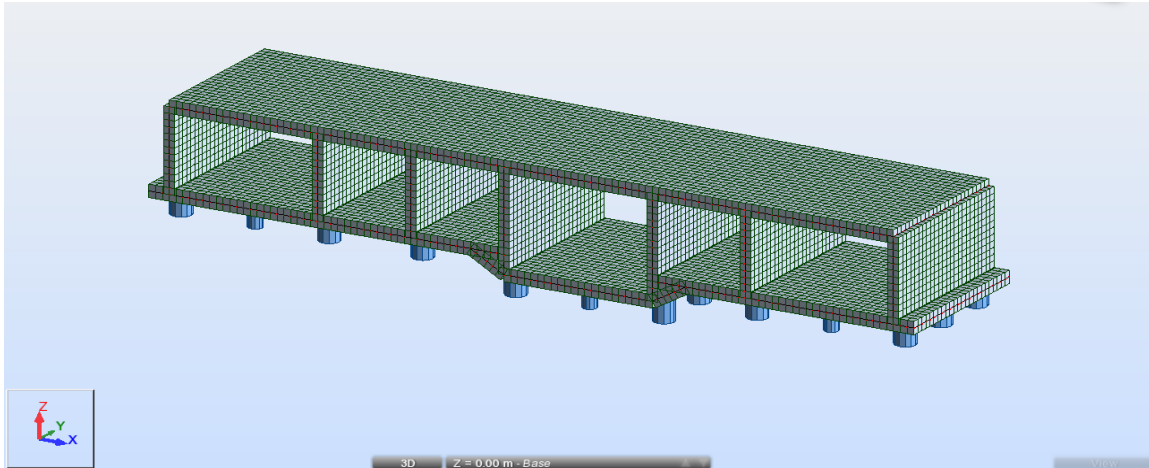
Long cross section of a tunnel placed under runway 2 and drive way L, M, N and P
